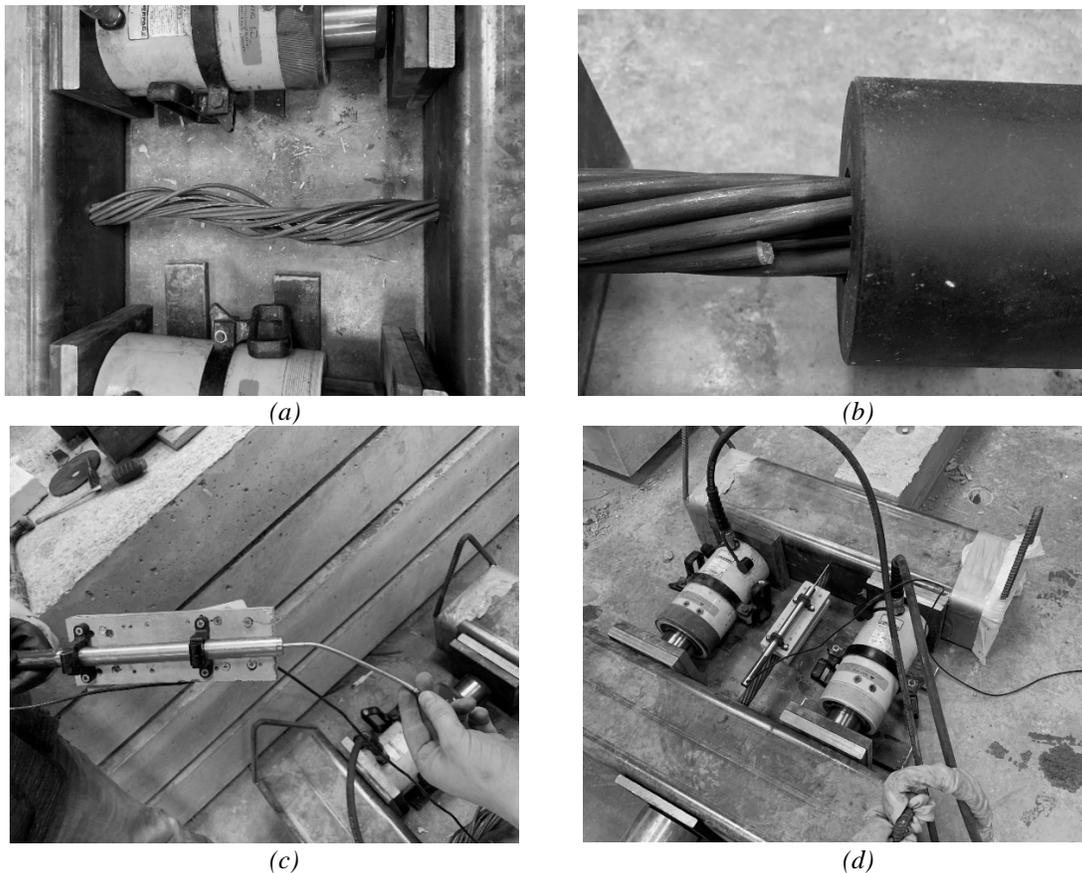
Abrupt failure of the strands (a), failure of strand at the chuck (b), and defective LVDT (c), and maximum ram travel during testing (d)
